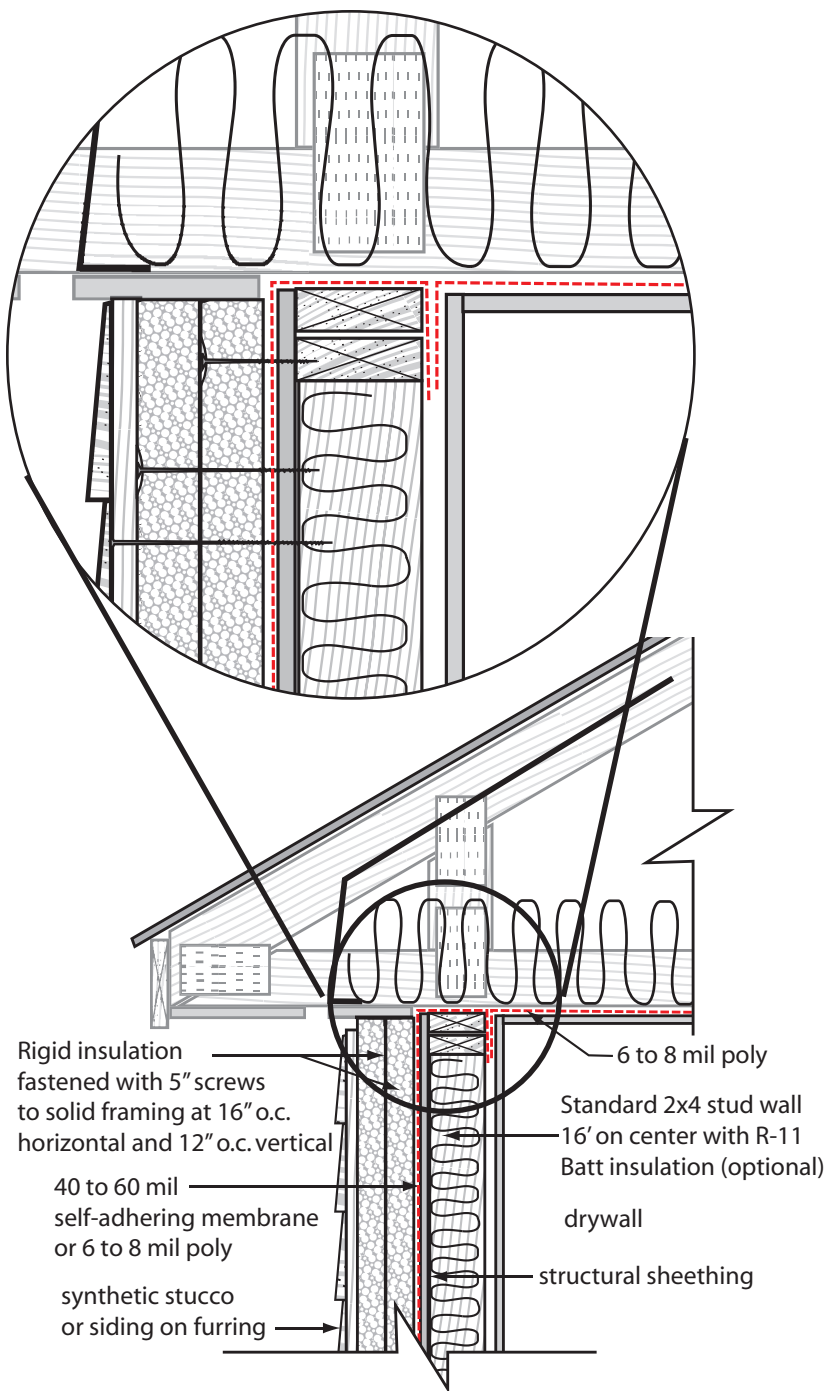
The top of a REMOTE wall. Top shows detail of wall-to-roof connection.
